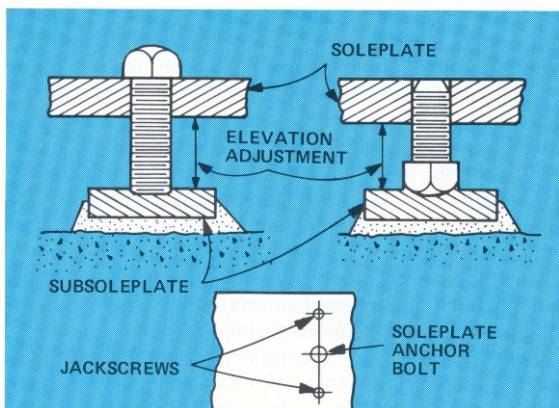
Temporary jackscrews can be used for leveling the soleplate and adjusting its elevation. Ideal location of jackscrews is in line with the soleplate anchor bolts.
